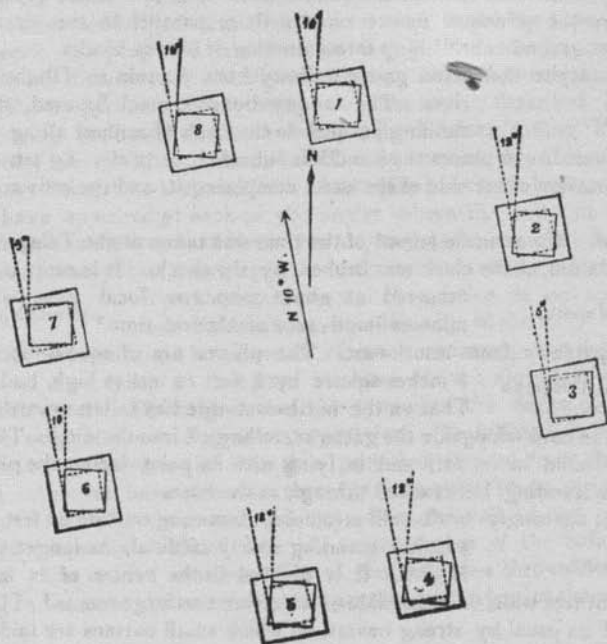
Plan of pillars of thermometer shed at Dhubri.
